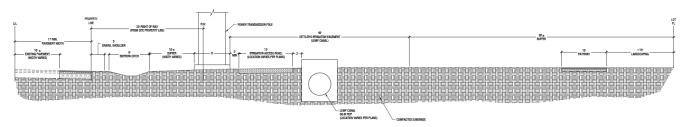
W. McMillan Road Elevation View showing Lemp Canal realigned to a 60-inch reinforced concrete pipe.
